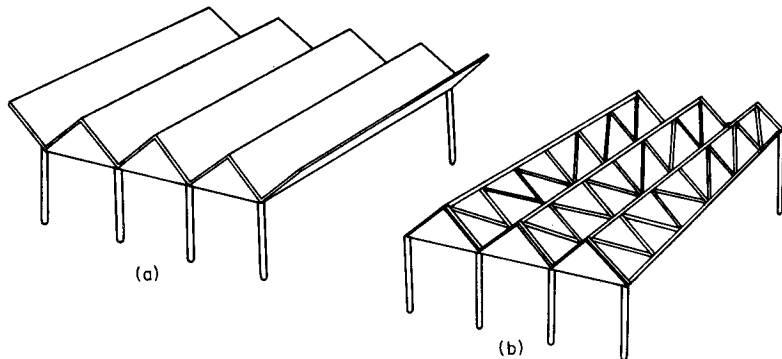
Folded plate roofs. (a) Solid plates. (b) Trussed plates.
